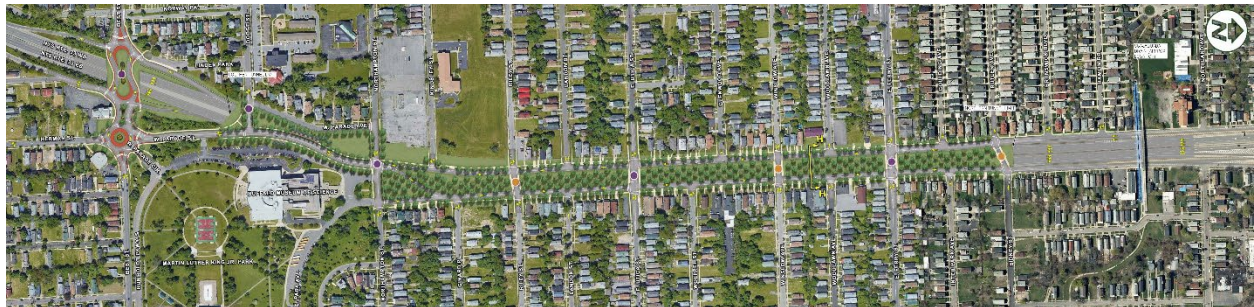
Build Alternative reconstruction with a 6-lane tunnel and tree-lined parkway setting (above tunnel)
